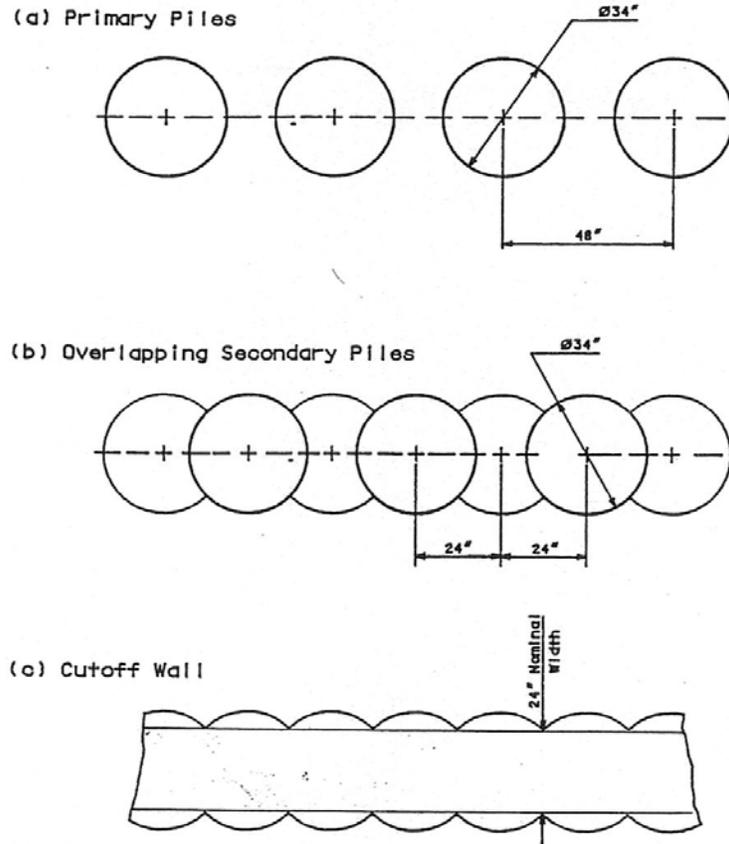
Construction sequence for a secant cut-off wall (Bruce and Dugnani, 1995).
